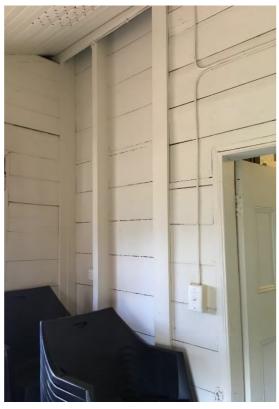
Bathroom showing the original external bracing and single skin construction of the core building along the south eastern wall (AHS, 2019).
